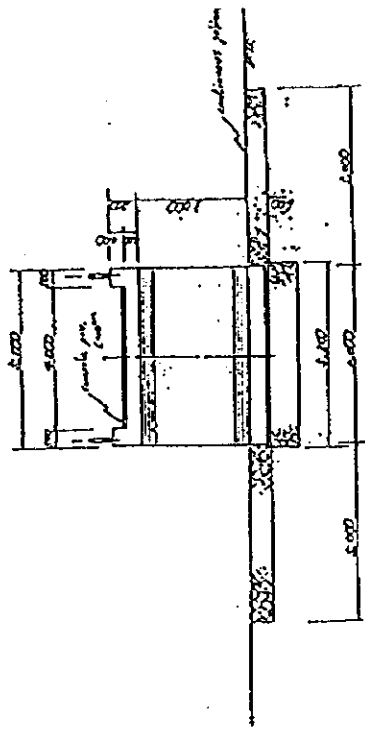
LOCATION OF REPAIRING ROAD AND TYPICAL SECTION (2)
